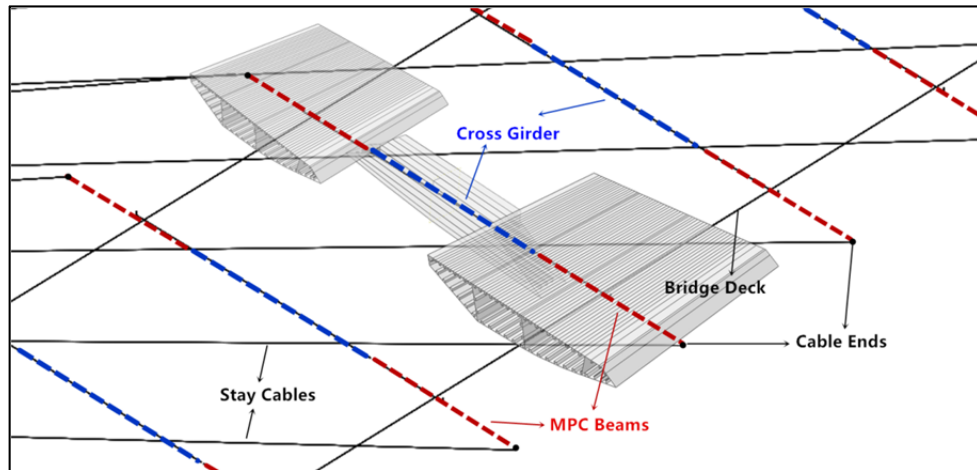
MPC (Multiple Point Constraints) beam between cables and bridge deck.
